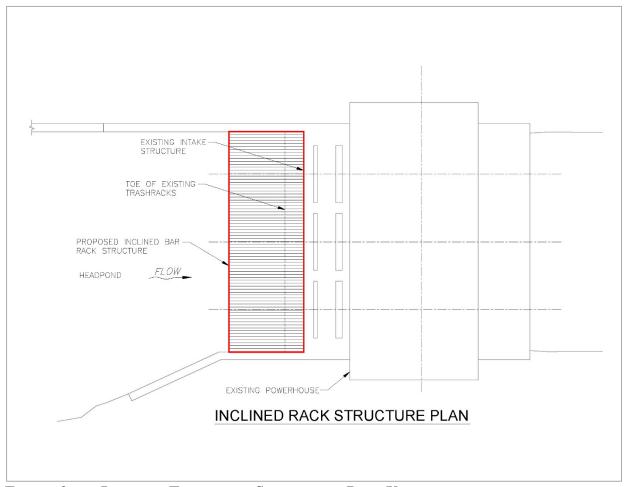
INCLINED TRASHRACK STRUCTURE - PLAN VIEW
